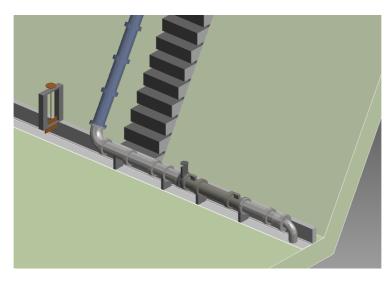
3D CAD drawing of turbine installation in existing channel.
